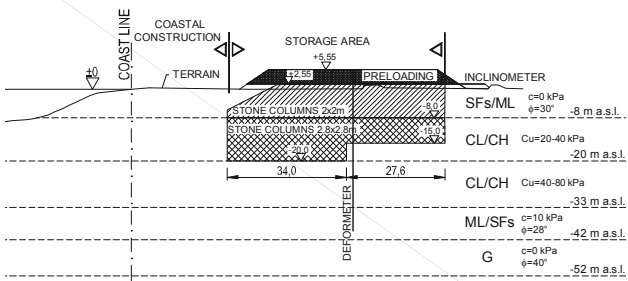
Construction phase I: improvement of foundation soil with stone columns and pre-loading in the area of storage and traffic surfaces.
